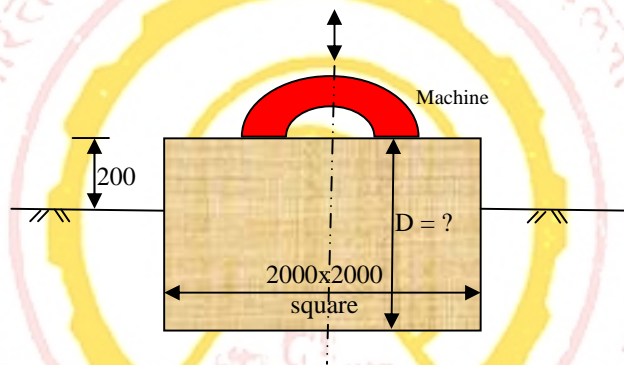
Foundation elevation for Question 1 (All dimensions in mm)
